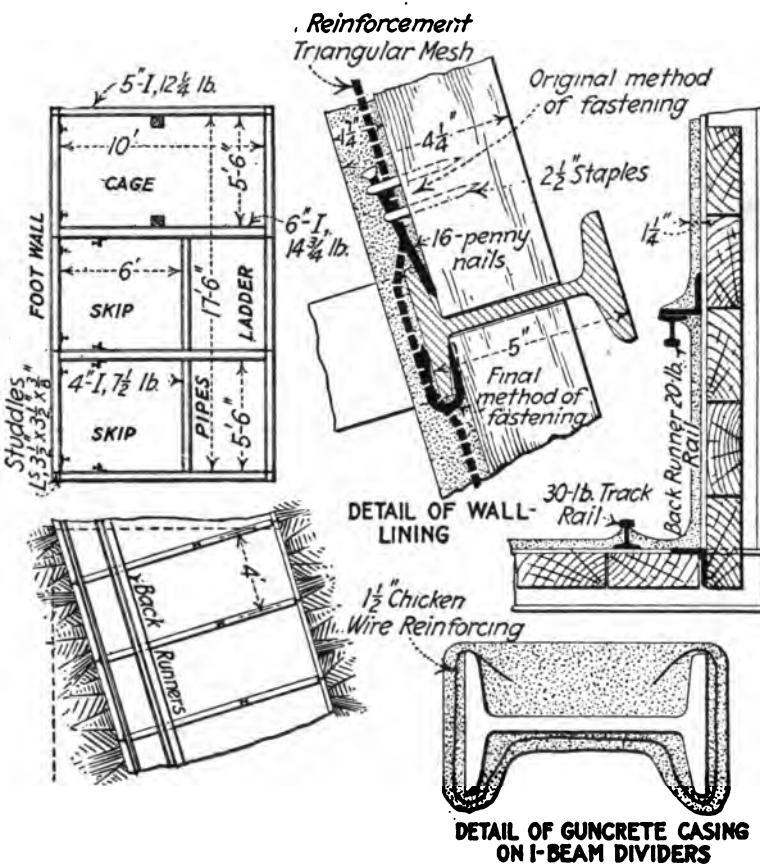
SHAFT ARRANGEMENT AND DETAIL OF COATED MEMBERS
